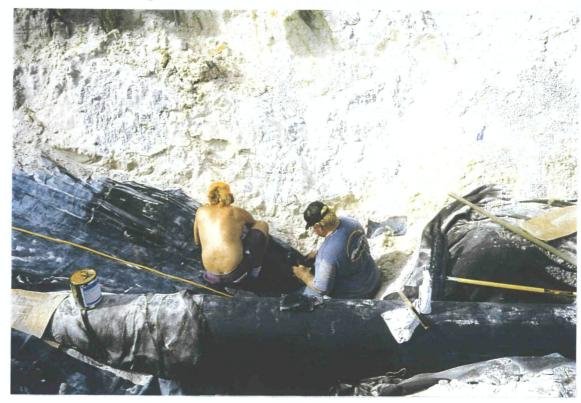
ERC overlapped the geotextile separator surrounding the pipe bedding aggregate with the geotextile separator below the vault bedding aggregate and placed No. 57 granite vault backfill.
